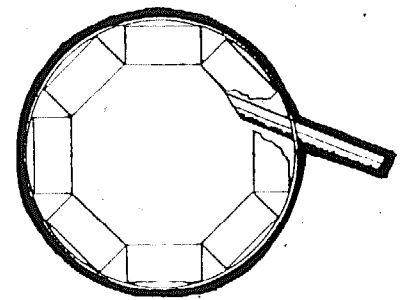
Plan view of first row of wall bricks, showing the pipe inserted through the drum wall.
